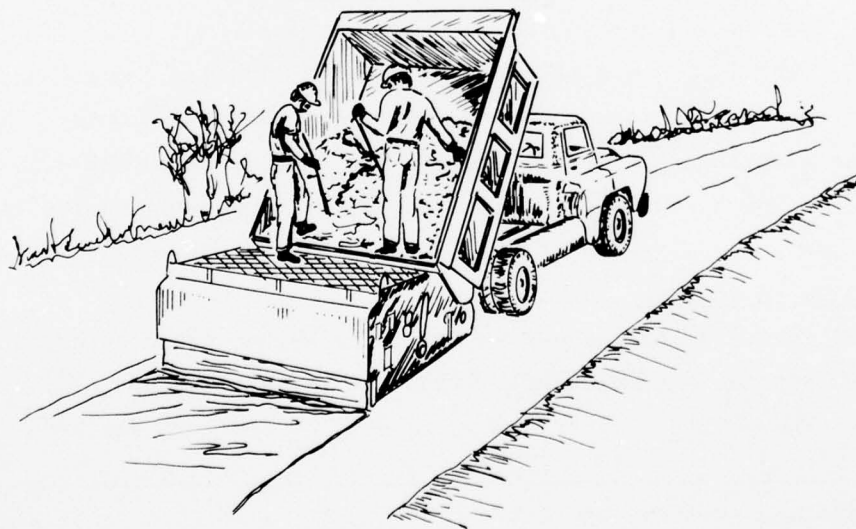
Placing of central-plant-mixed stabilized soil with spreader box
